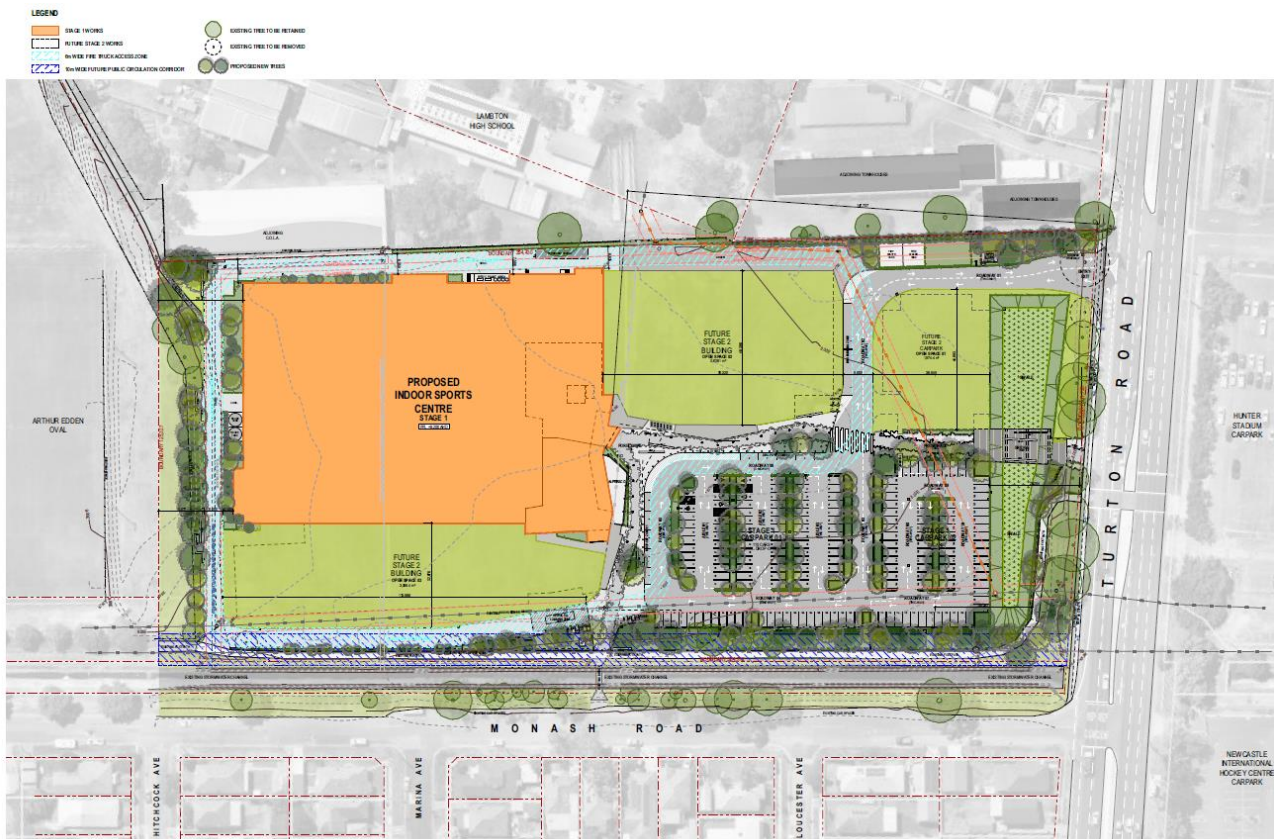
Proposed Site Plan - Stage 1 (Source: EJE Architecture)
